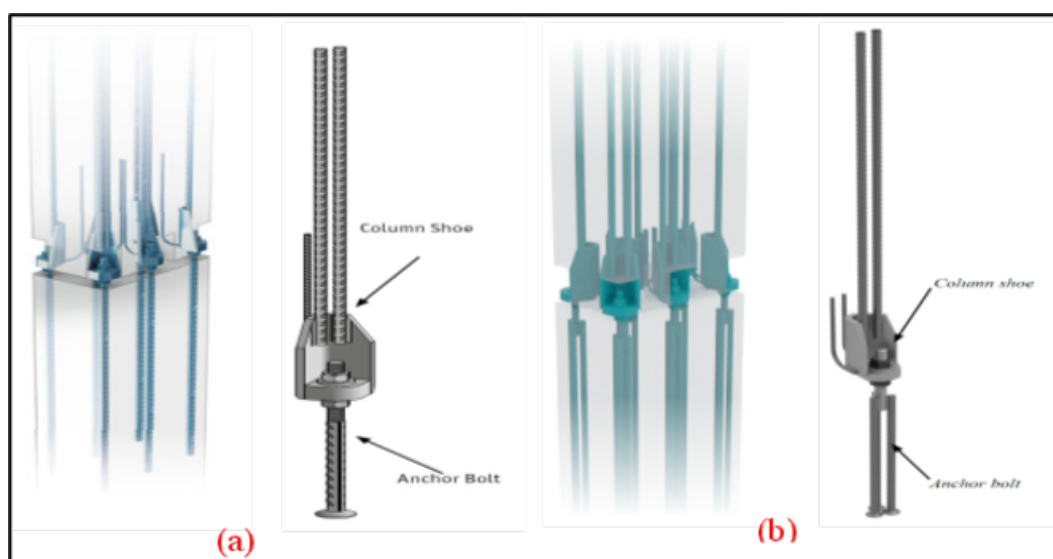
Peikko bolted connection (PBC) for column (a) HPKM column shoe [13], (b) BOLDA column shoe [14]
